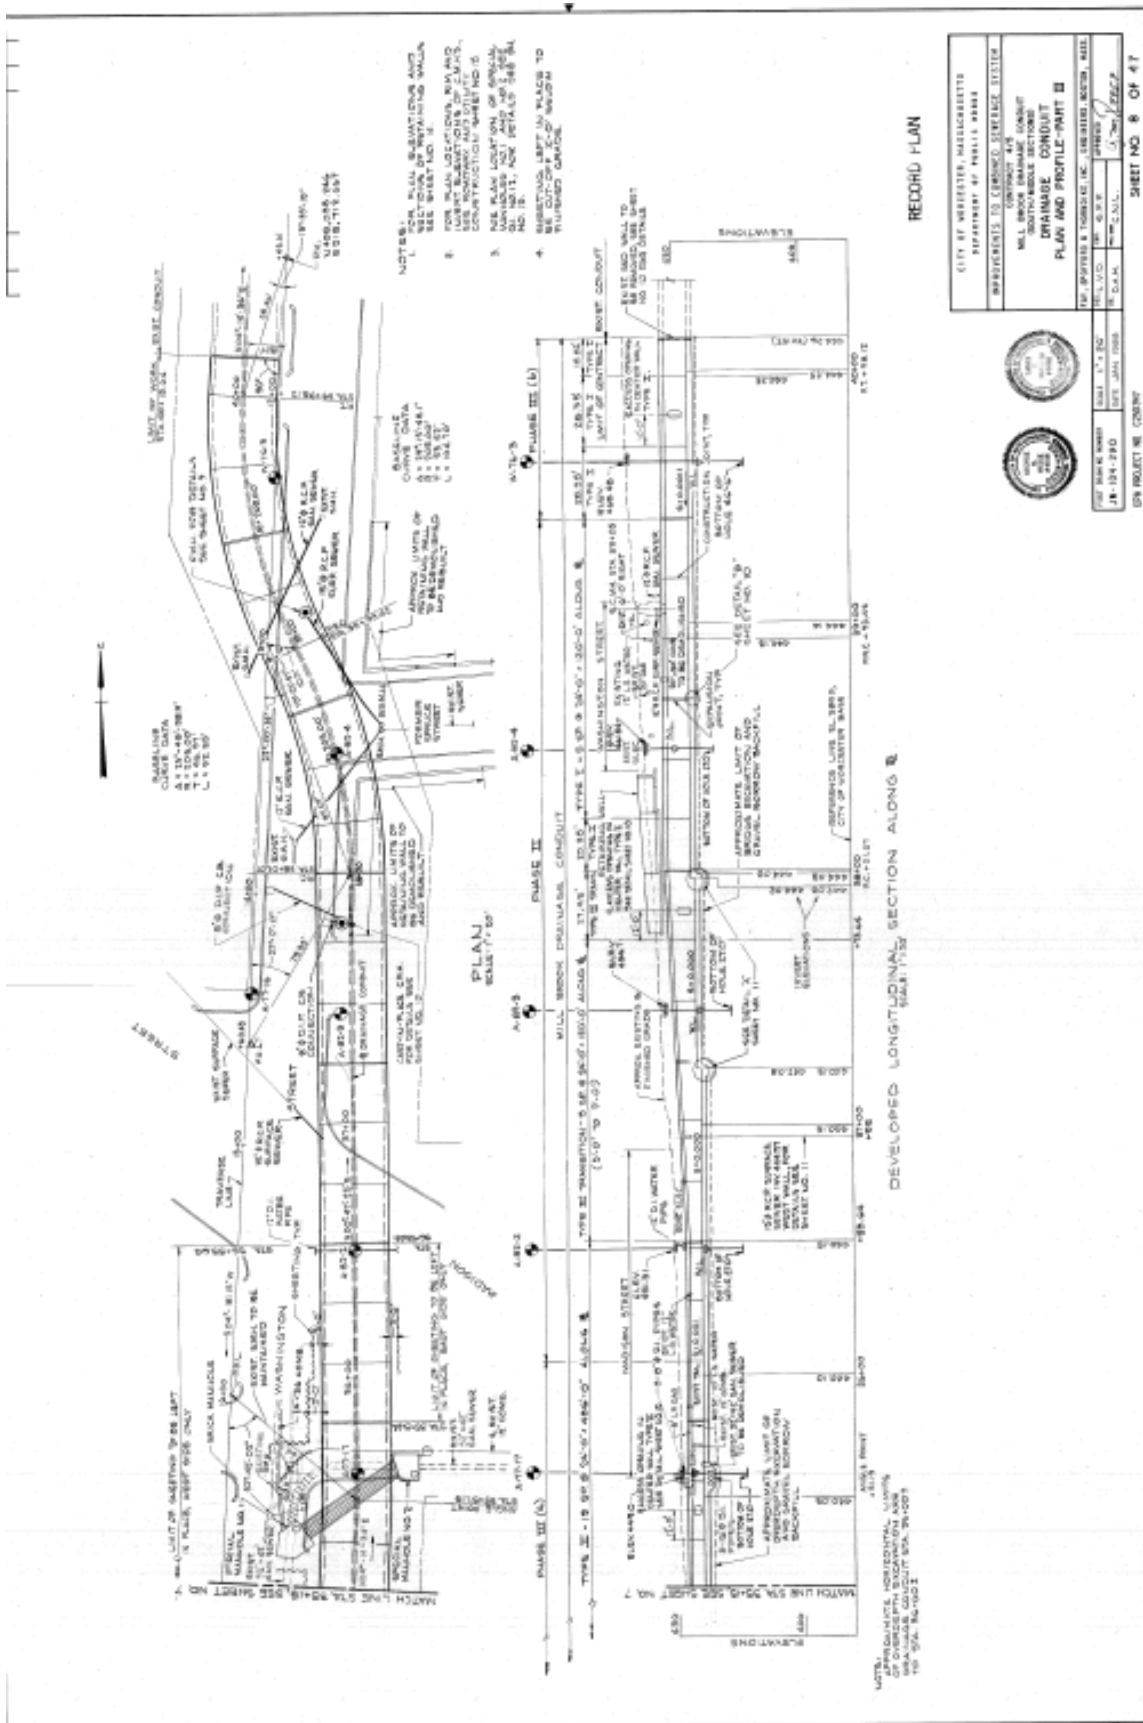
Improvements to Combined Sewerage System Contract No. 4-5 - Drainage Conduit Plan and Profile Part III
